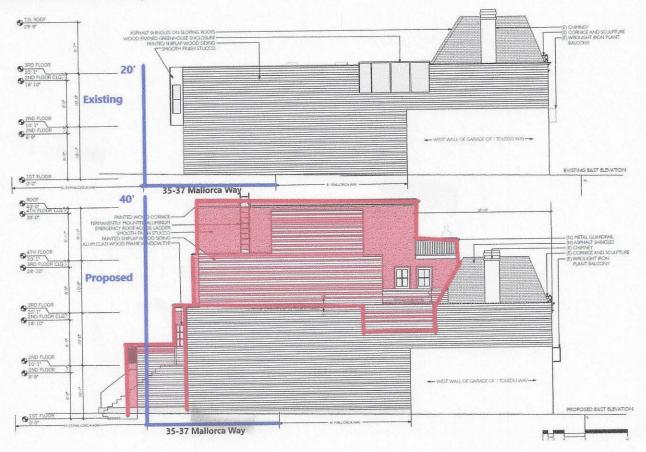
Drawing showing the portion of the existing 20' building and proposed 40' building adjacent to the rear of 35-37 Mallorca
